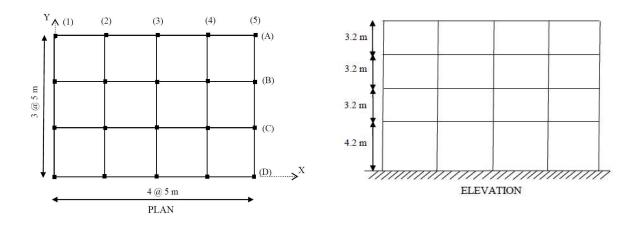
Plan and elevation of a four storey RC moment resisting frame
